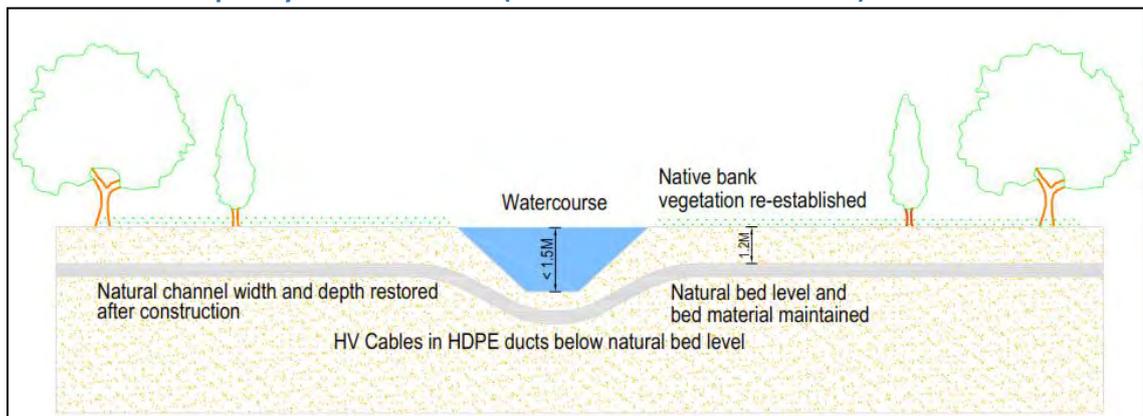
Indicative Temporary Dam and Divert (Post-Installation Cross-Sectional View)
